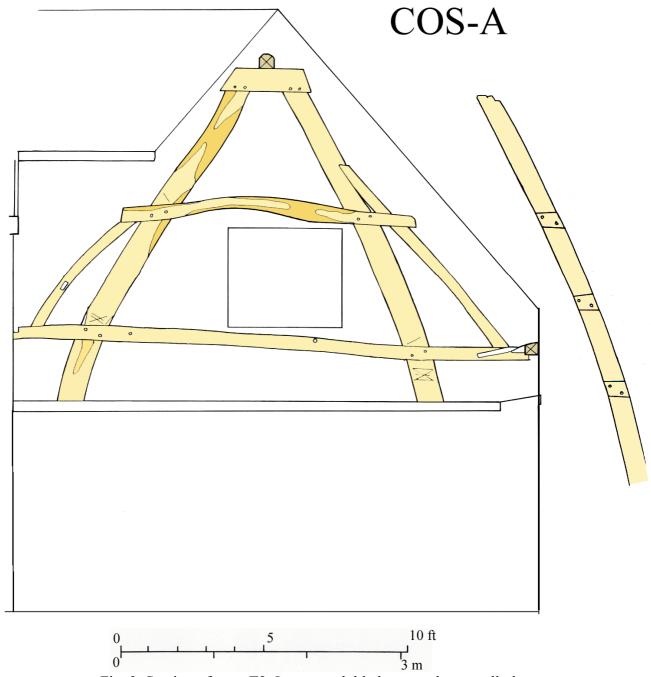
Section of truss T2. Inset: cruck blade re-used as a wall plate
